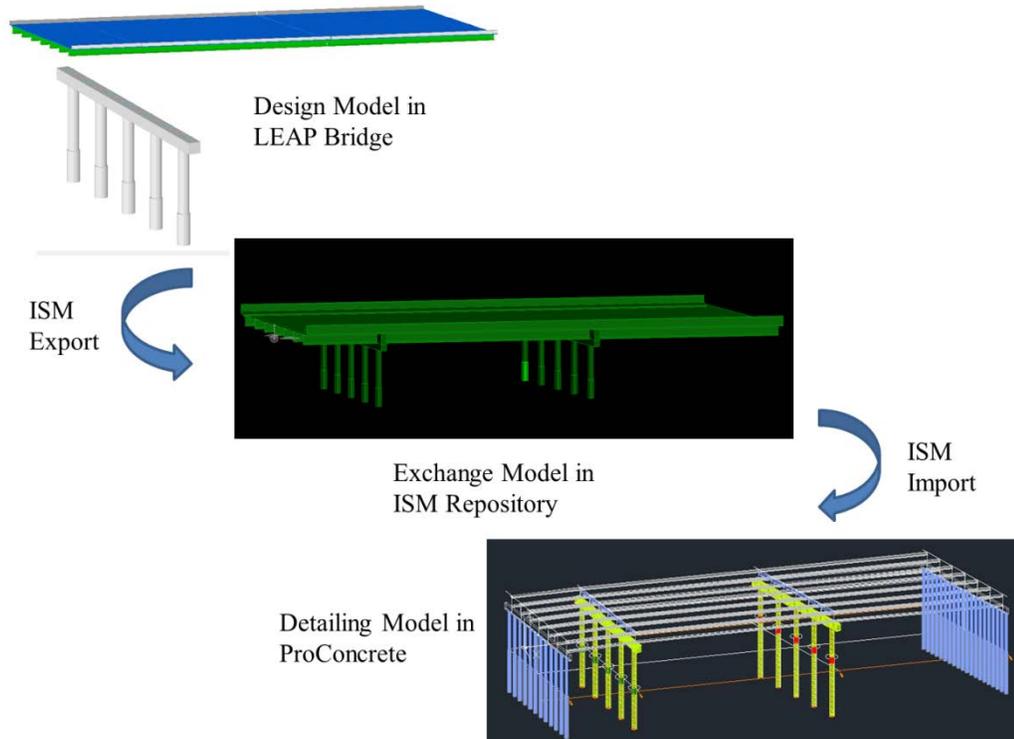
A Case Study for the Use Case - Bridge Design to Bridge Detailing
